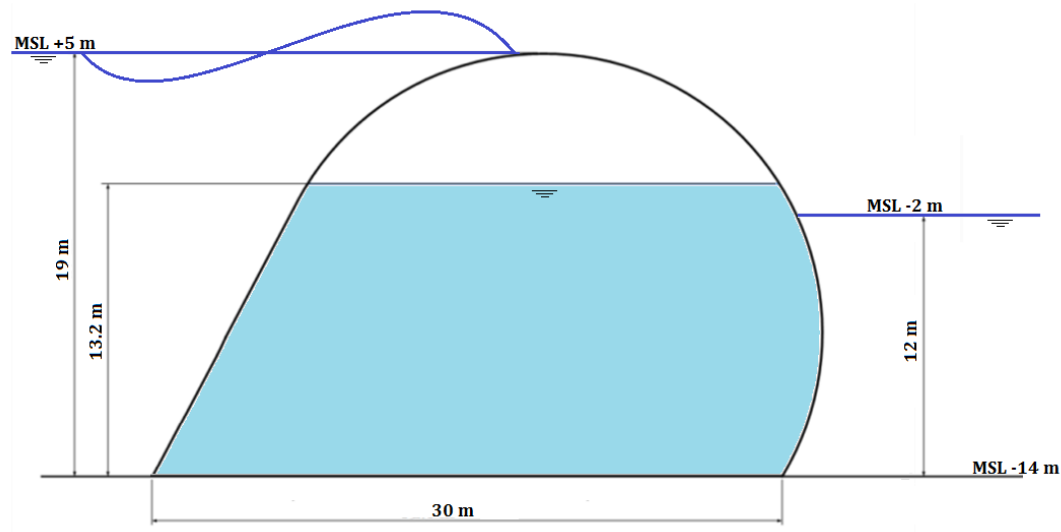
Cross-section largest inflatable dam of Bolivar Roads barrier (loaded).
